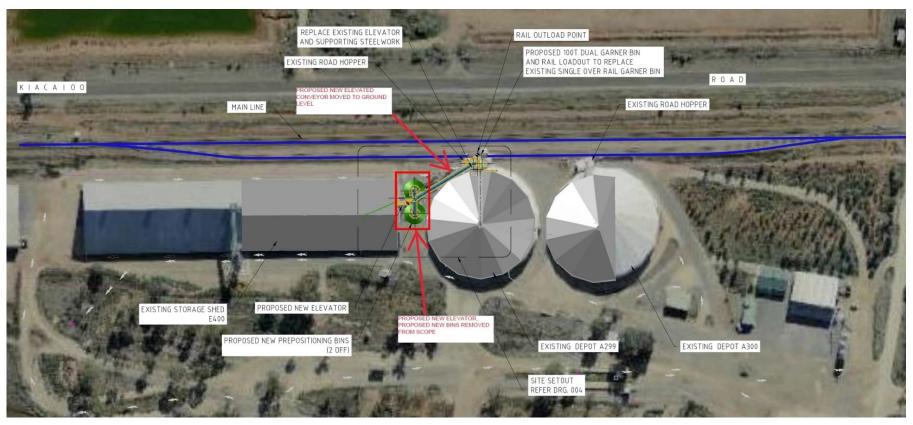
Proposed Project layout – showing the new elevator and two grain silos that were part of the approved DA plans
